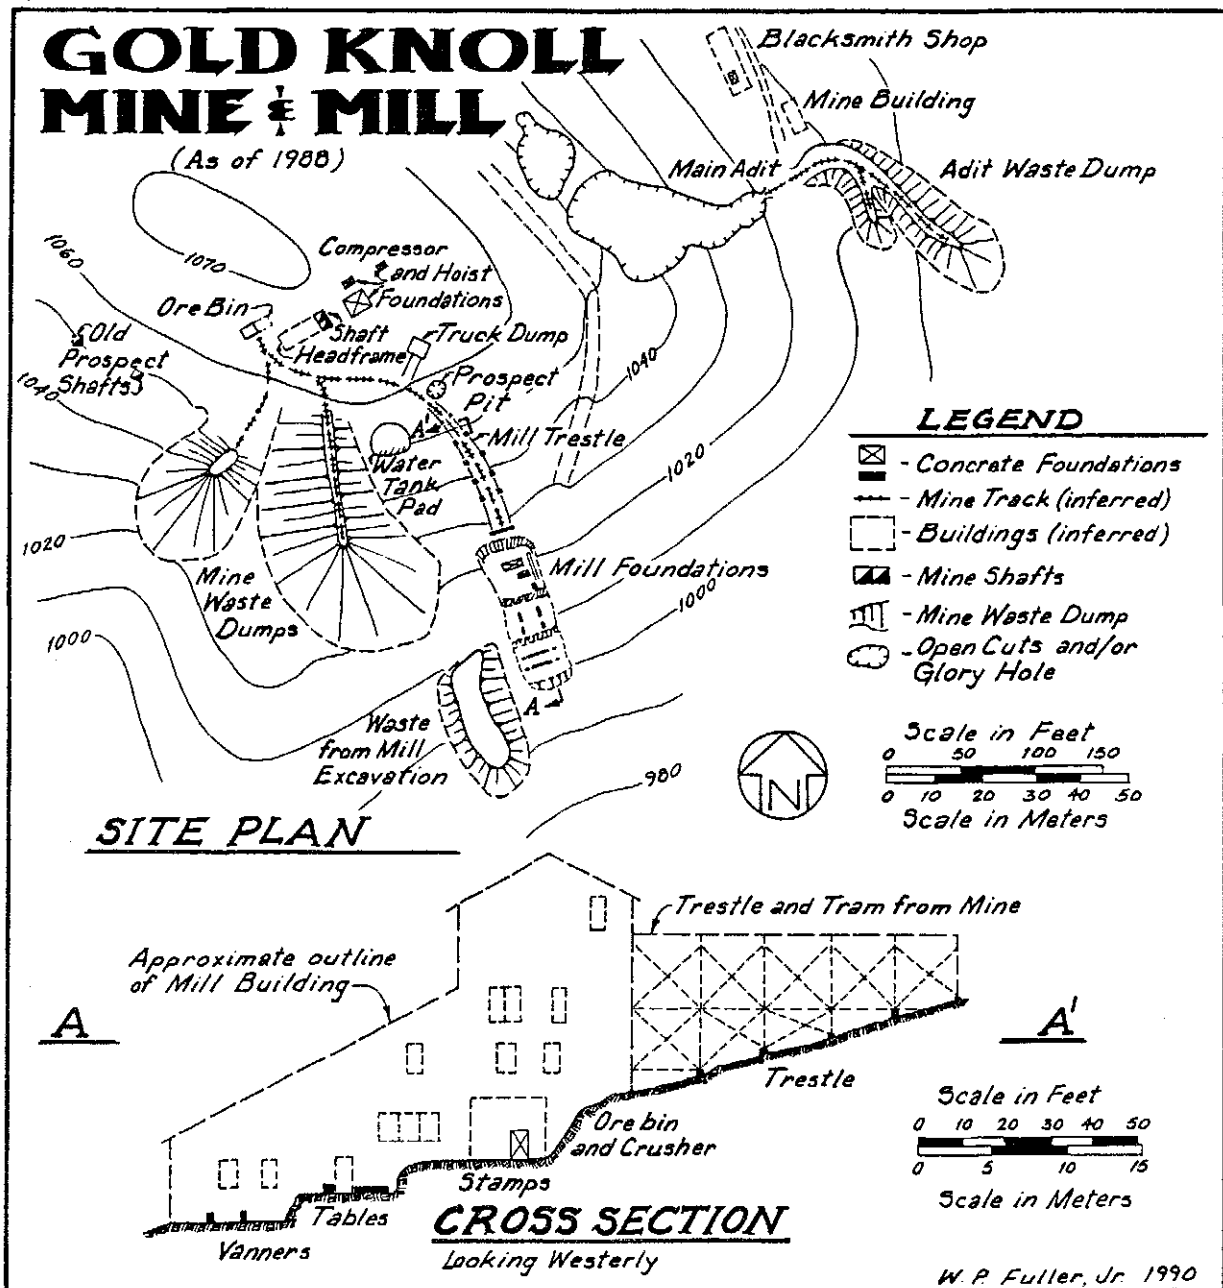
Site plan of the Gold Knoll mine and cross section of the mill building.
